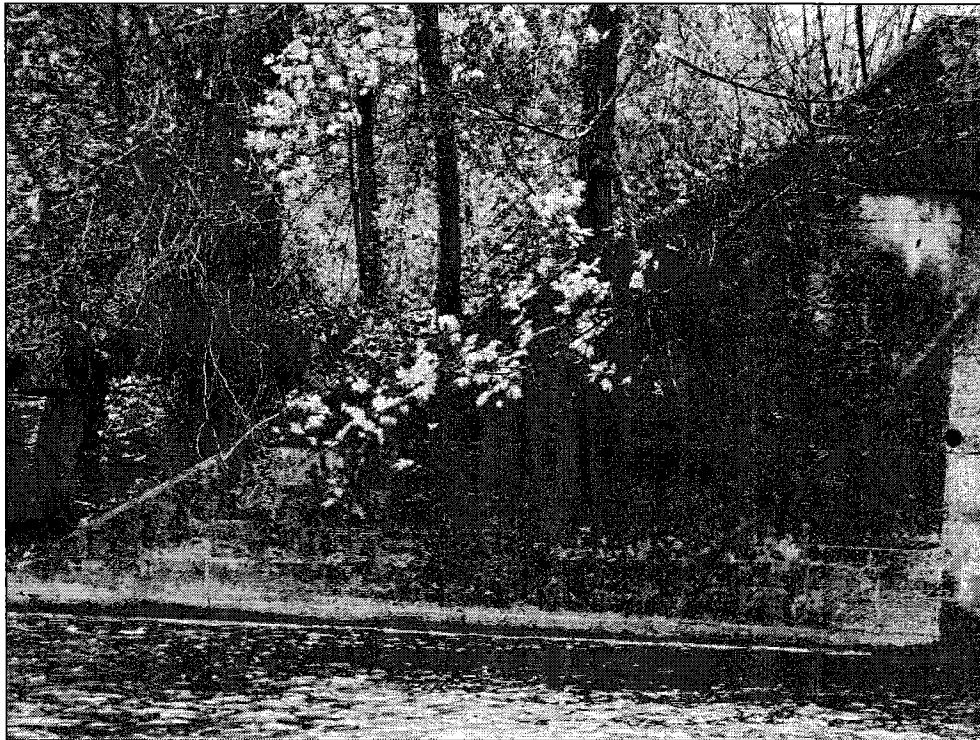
Typical Condition of West Abutment (good condition – localized spalling)
